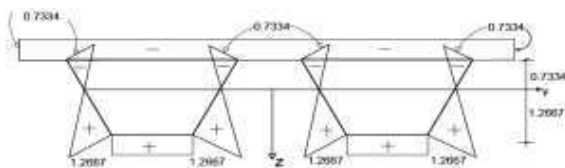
Simply Supported Girder Section and Cross Section Distortion
